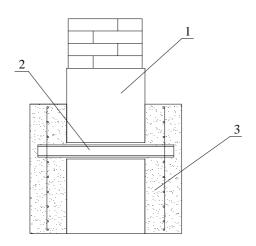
Structural scheme of installation of metal-rolling profiles in reinforced foundation: 1 – reinforced foundation; 2 – transverse metal beams installed into holes punched in a wall of foundation; 3 – tides of concrete; 4 – concrete preparation
